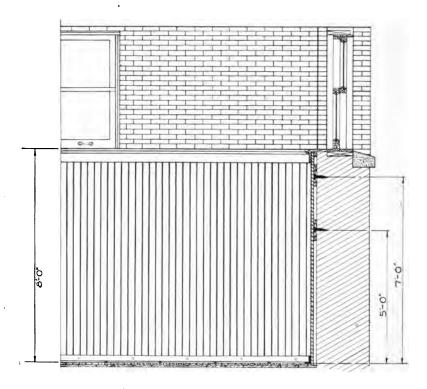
Wainscoted Wall. Special wall attachment is required to provide necessary strength. Note double floor construction and angle iron base.
